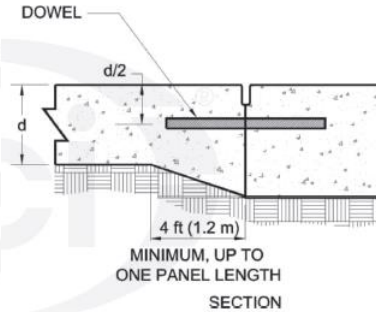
Transition between sections of pavement different thicknesses.
